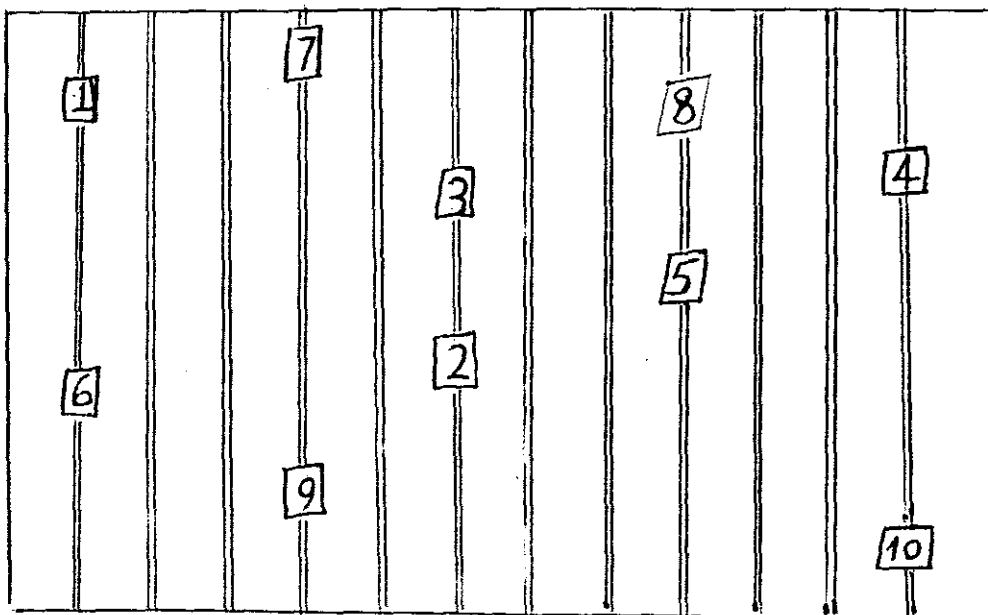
layout of papers on the slab soffit after sealing the soffit joints.
